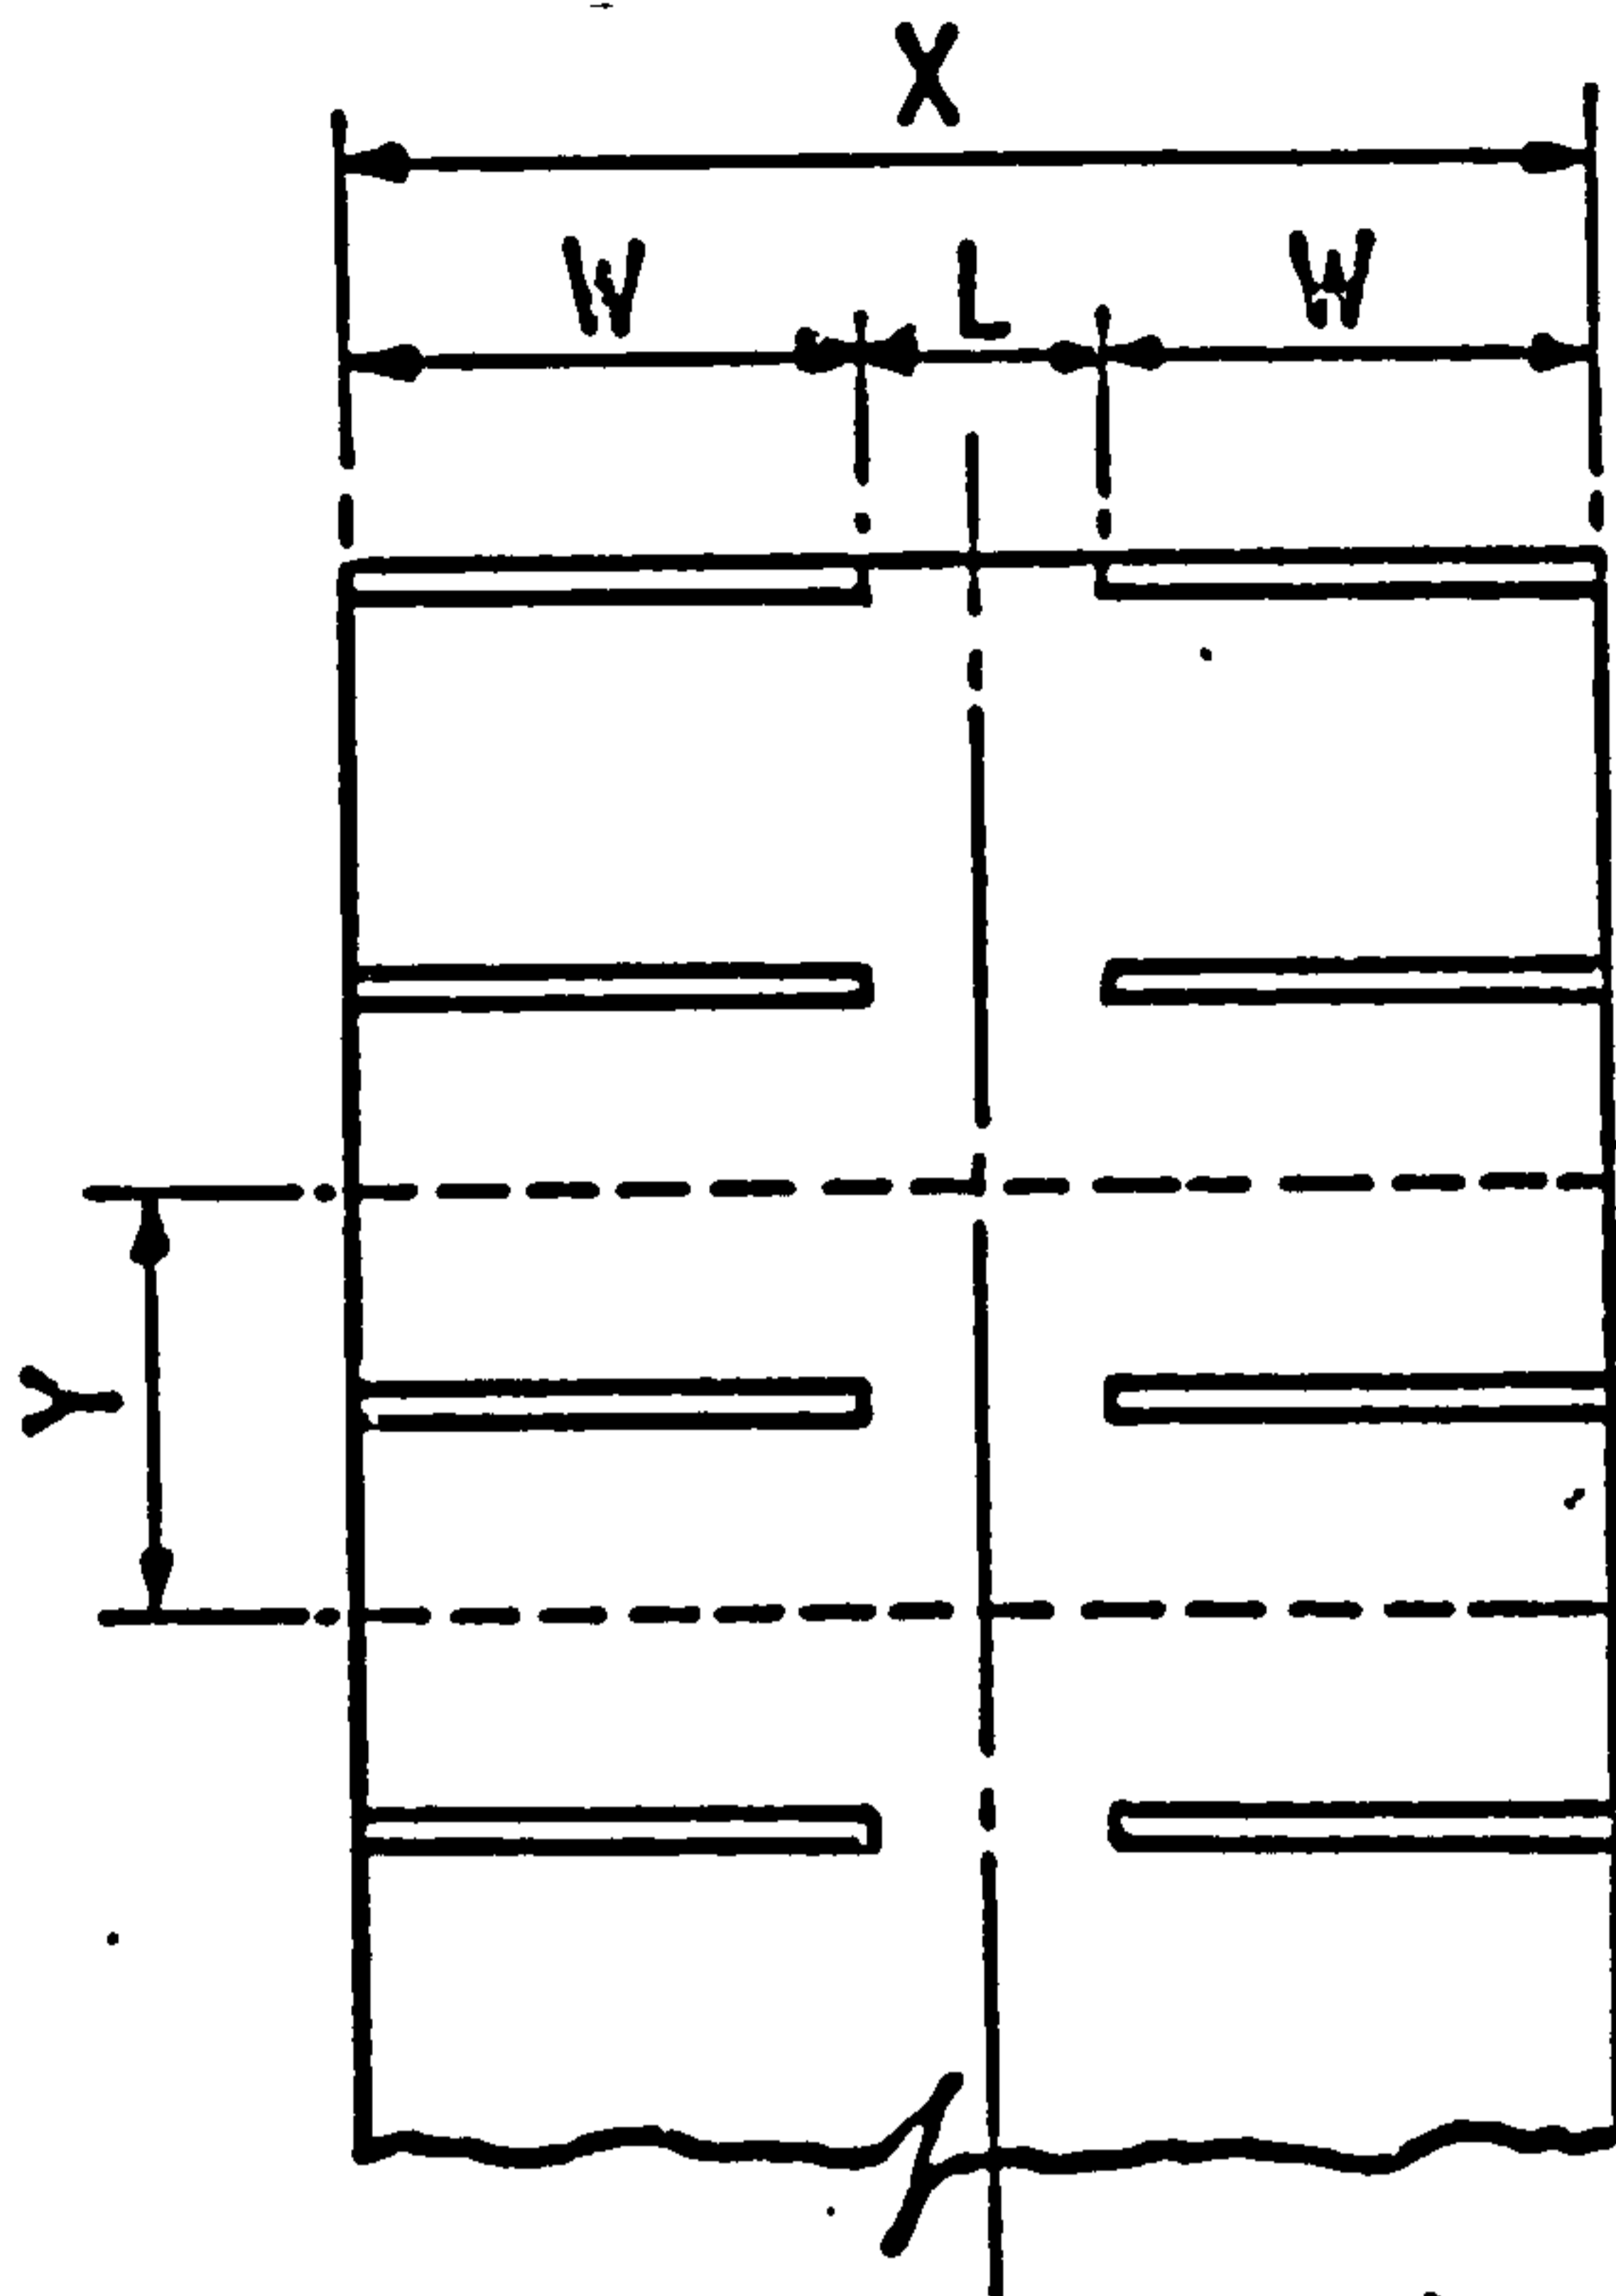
Typical Floor Plan of Cross-Wall Structure
